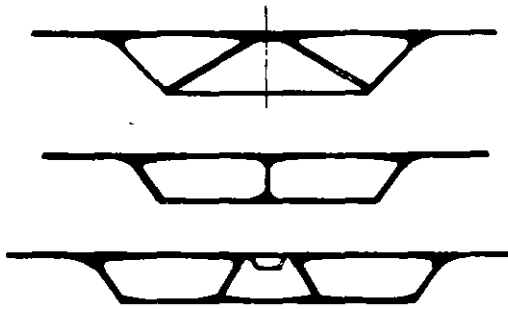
Cross-section of the deck for one axial layer of stays
